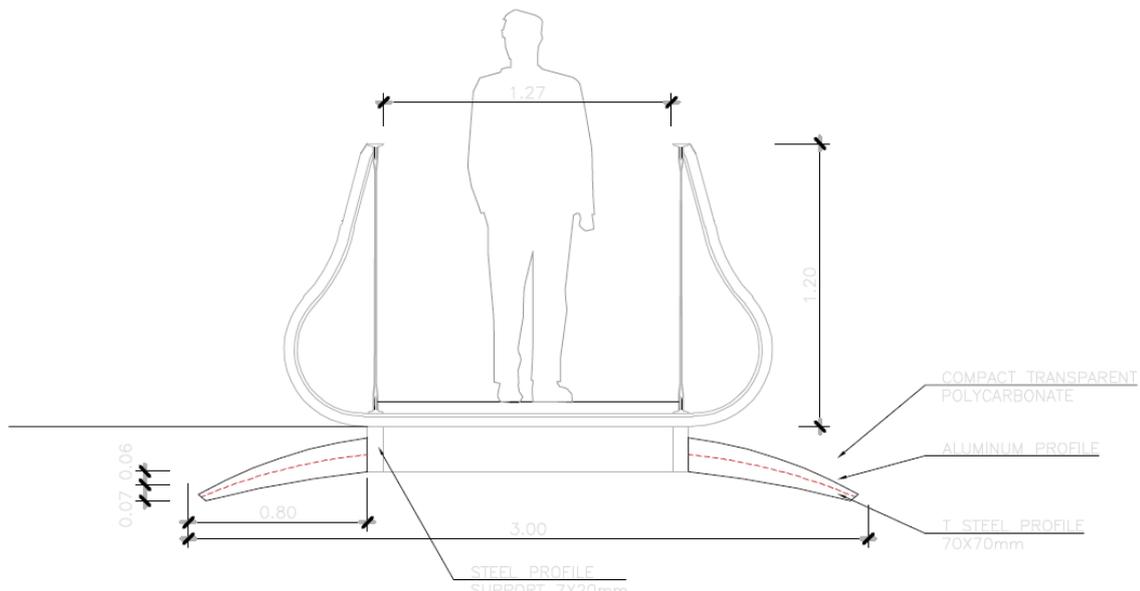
Proposed parapet solution at OBG12 Clonsilla station footbridge
